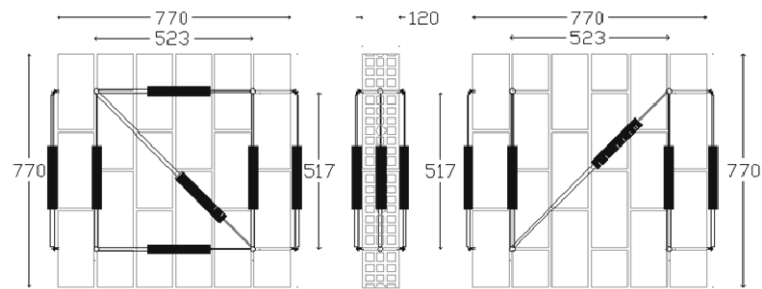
half-full brick panels layout of sensors on the wall compressed orthogonally to holes [mm]
